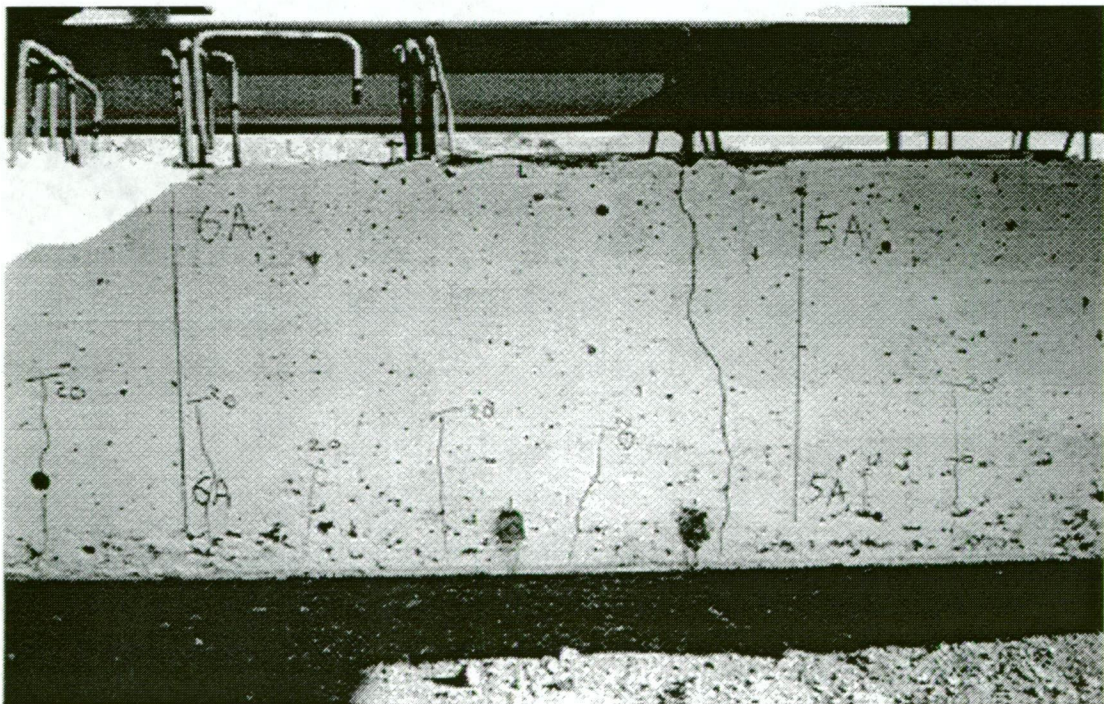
Flexural Beam Crack Patterns
